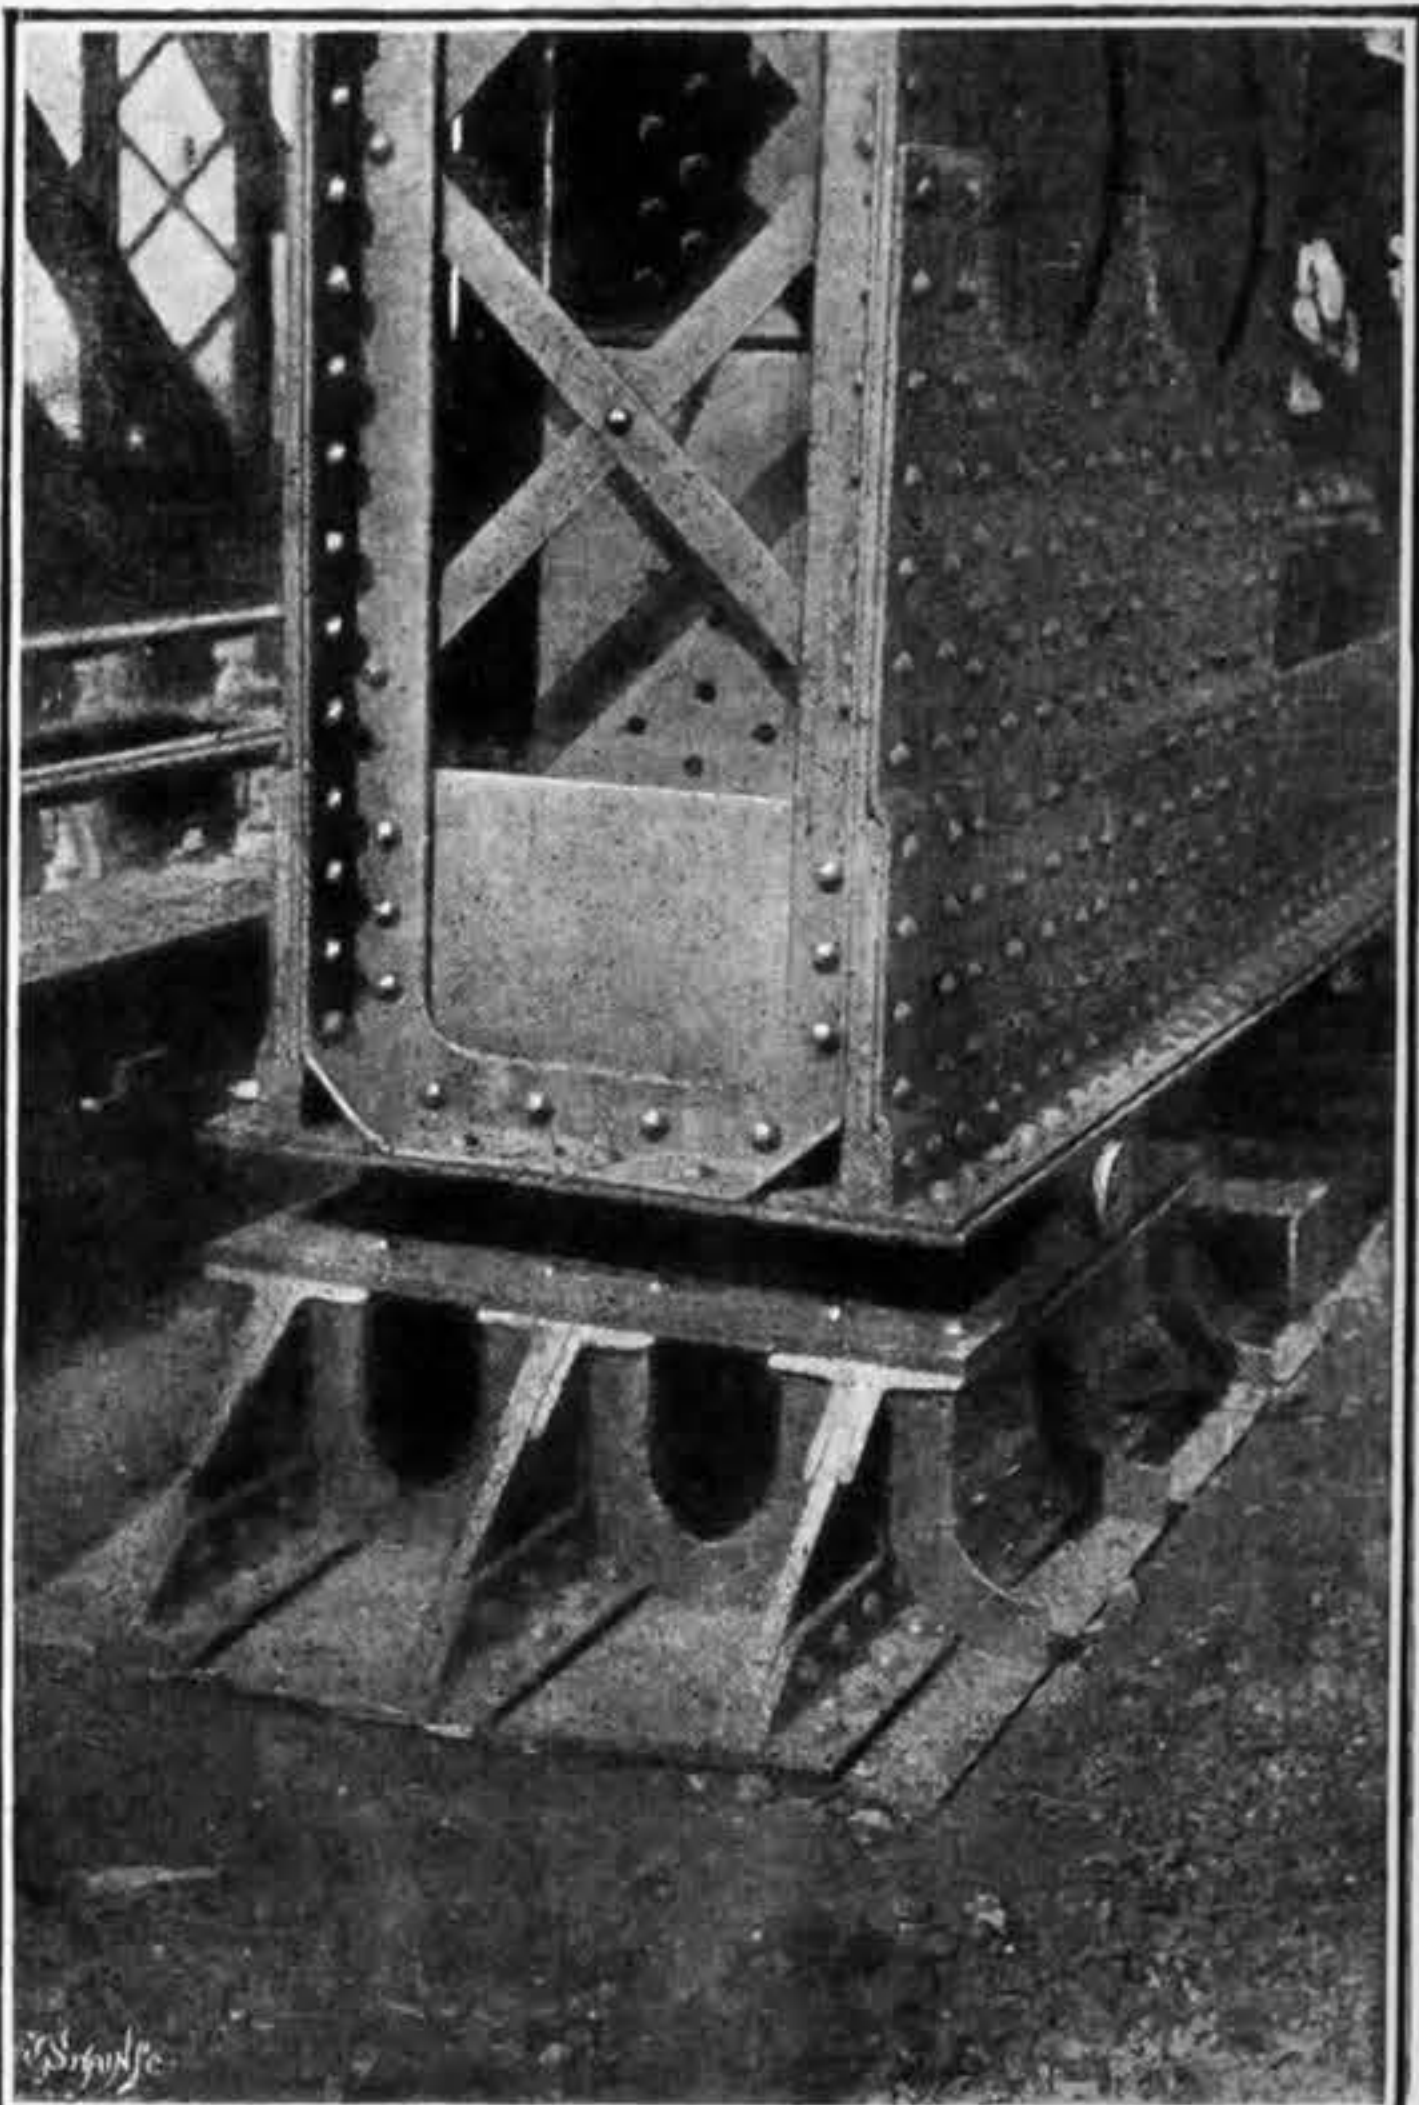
GENERAL VIEW OF FIXED BEARING.
